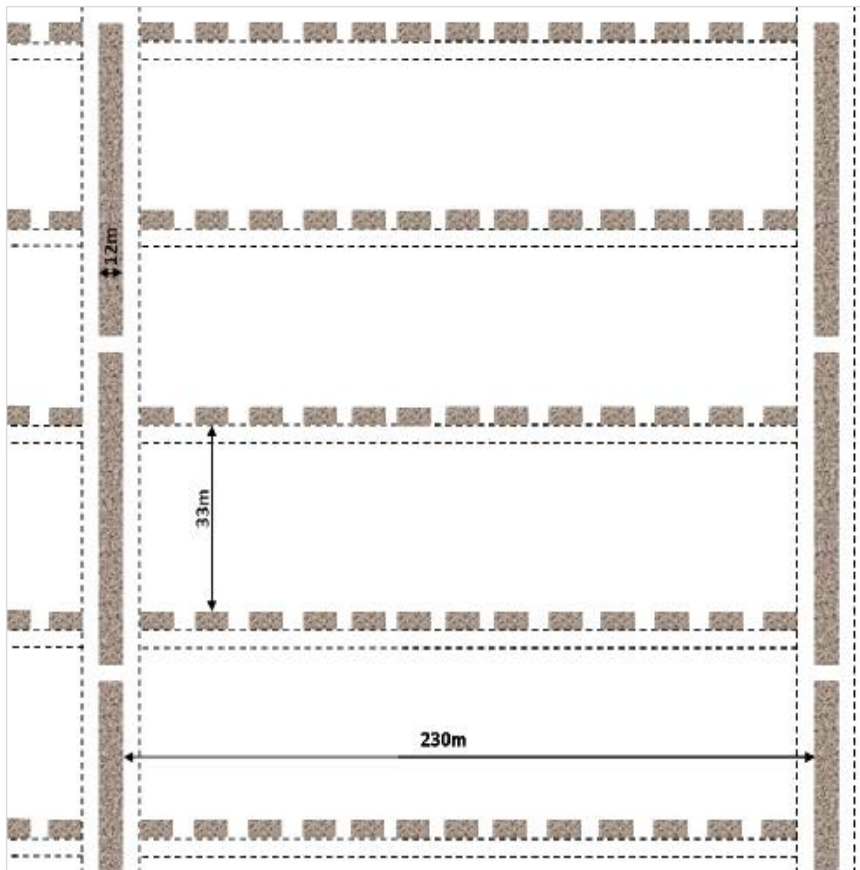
Breast mining layout planned at BPM (TWP, 2013)
